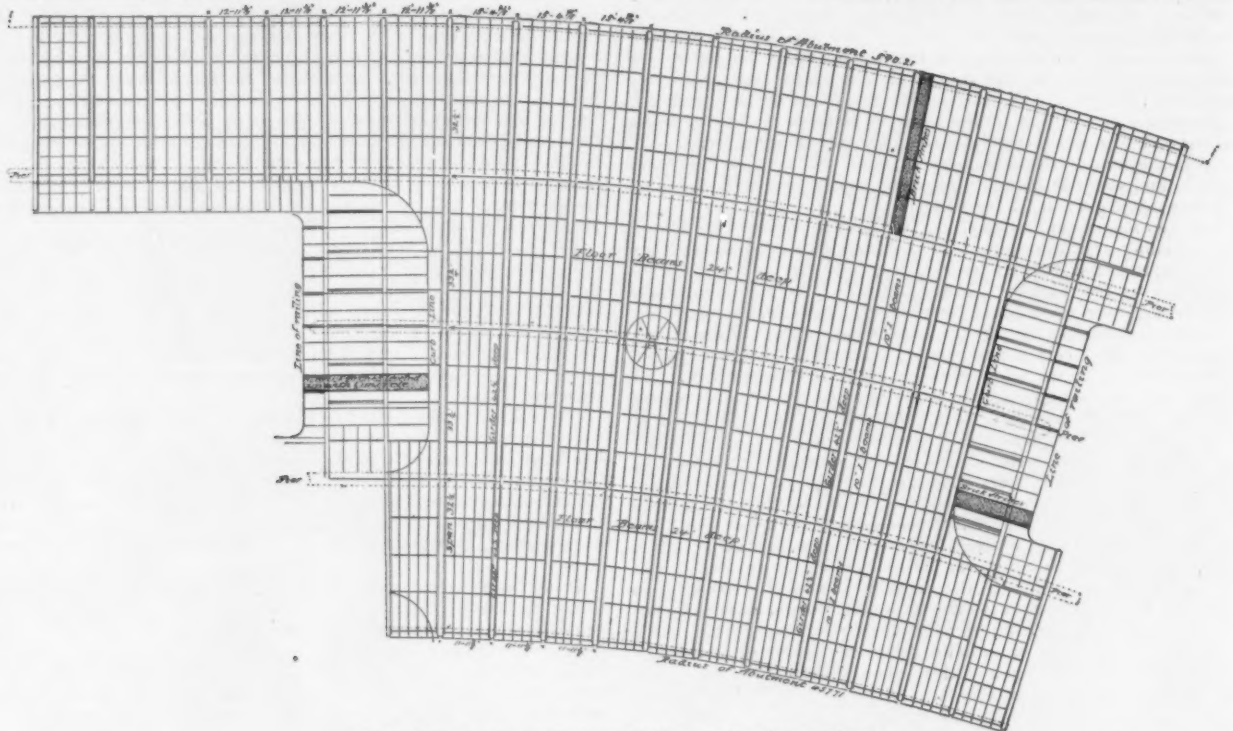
Floor System of Weybosset Bridge over Providence River.
